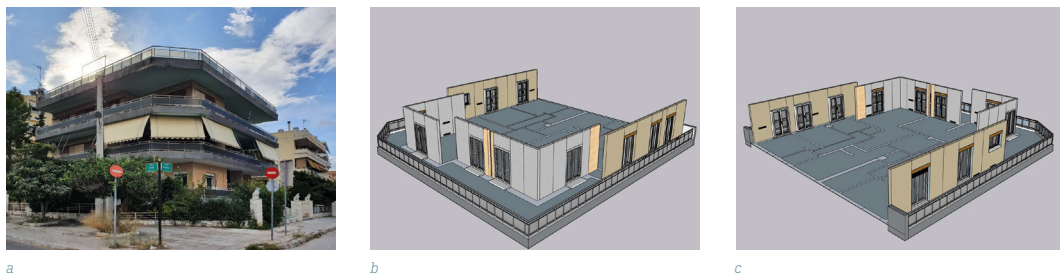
Greek pilot building (a) – Isometric views of SmartWall application on 1st floor (b & c)
